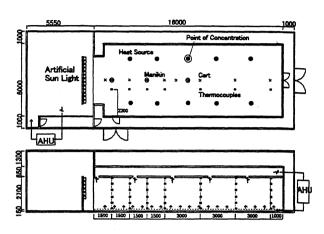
Plan and section of experimental chamber with measurement points (unit in mm)
